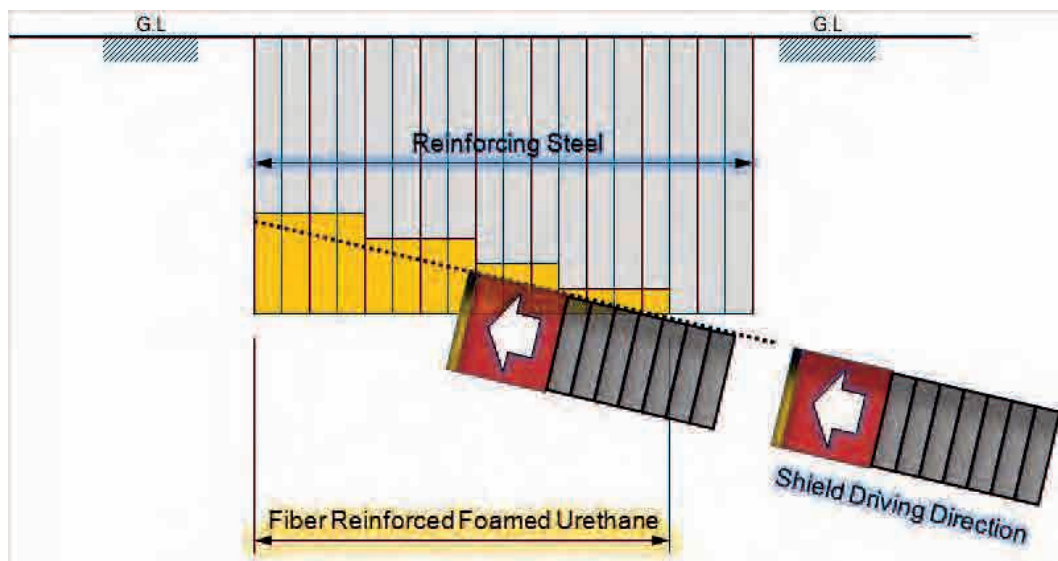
Boring of Soil-Cement Diaphragm Wall by TBM
